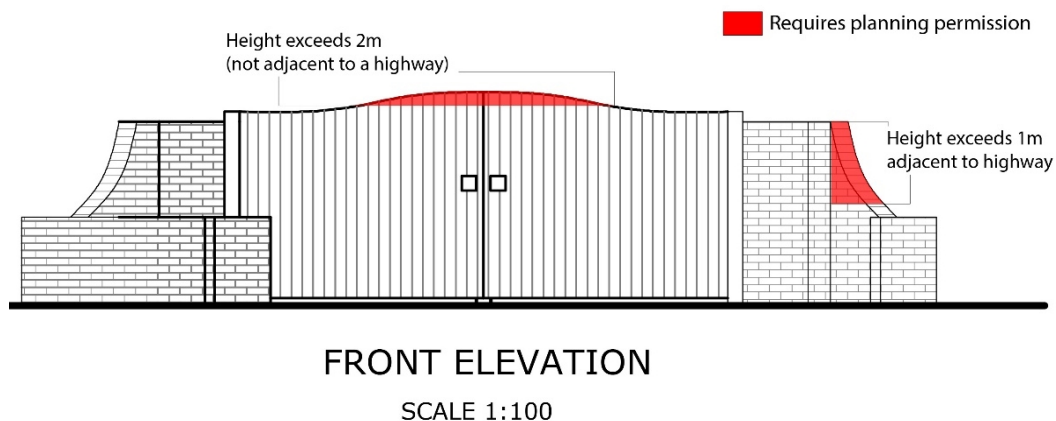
illustrates the elements of the boundary wall and gate (highlighted in red) that requires planning permission.
